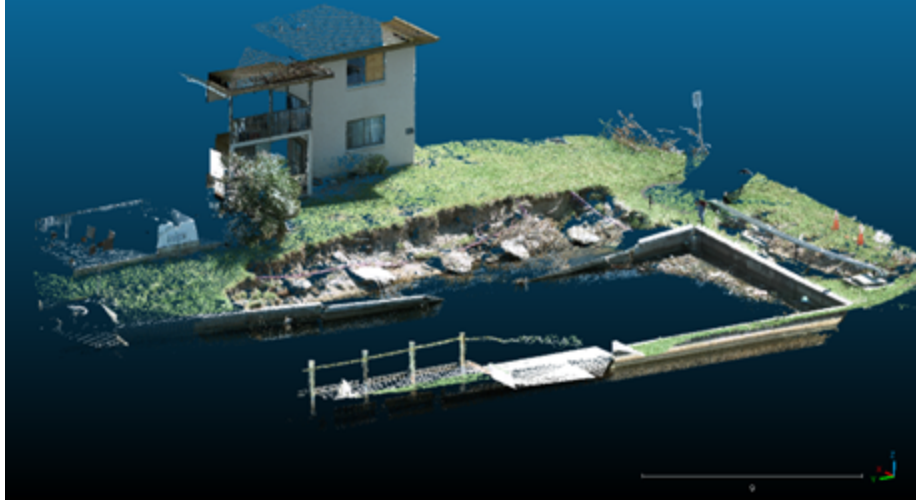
Cape Coral: Terrestrial LiDAR scan of a canal retaining wall in a residential neighborhood. Coordinates 26.564127, -81.963464
